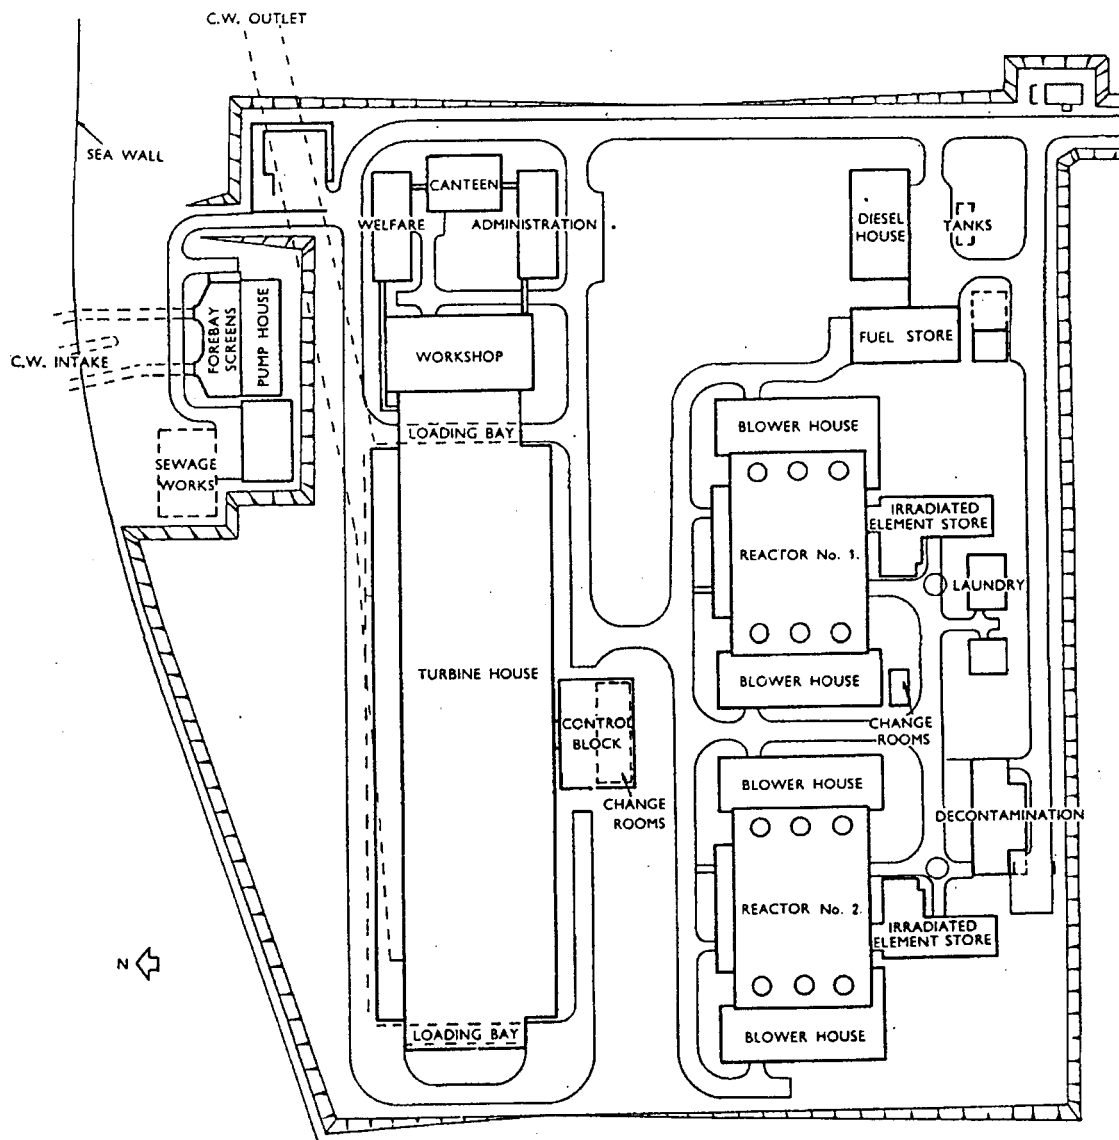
Site plan of Hinkley Point Magnox Station.
